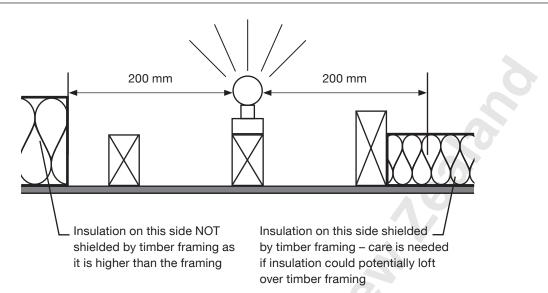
Example of underfloor insulation installed with clearance around a light fitting mounted to the bottom of a floor joist
